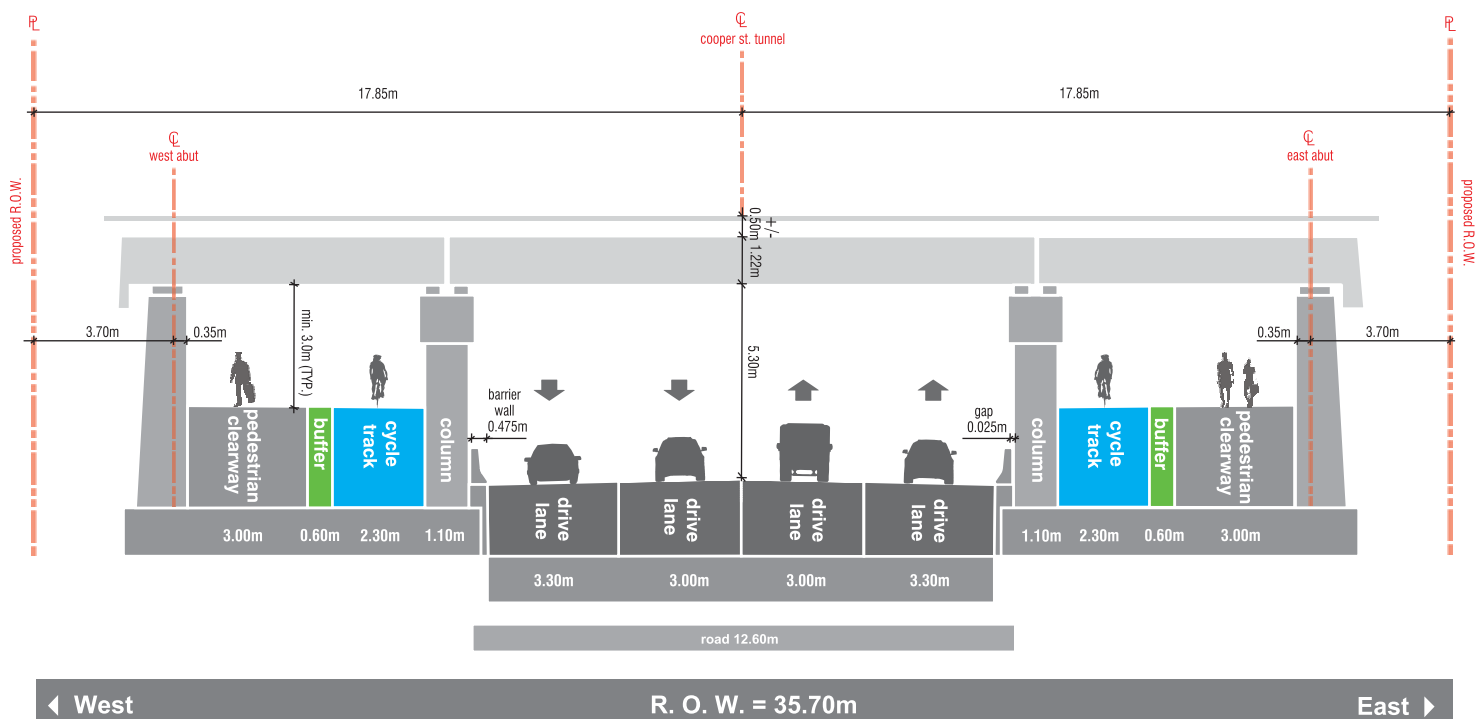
Cooper Street Tunnel Evaluation of Alternatives
